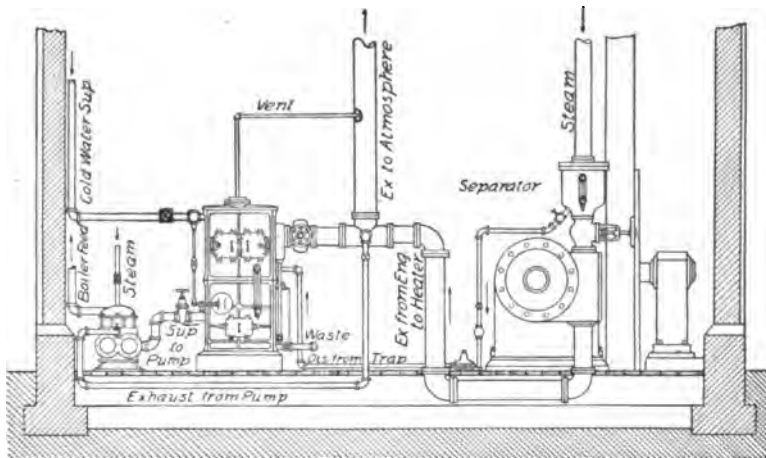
Method of Making Connections when Only a Portion of Exhaust from Engine is Allowed to Enter.
